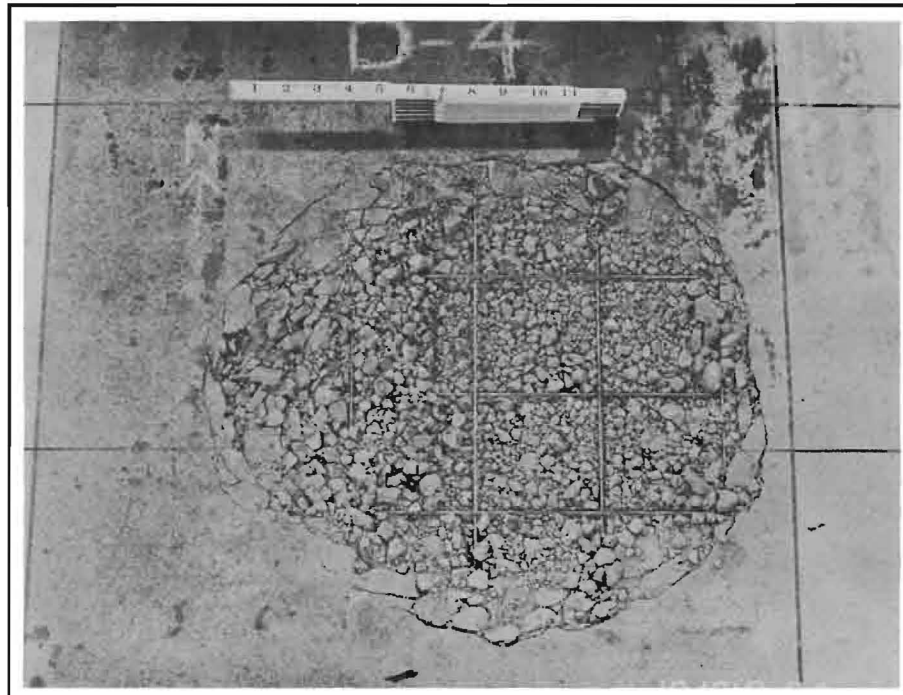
Initial failure in the top surface of Slab DM-5, showing exposed prestressing wires and completely disintegrated concrete.
